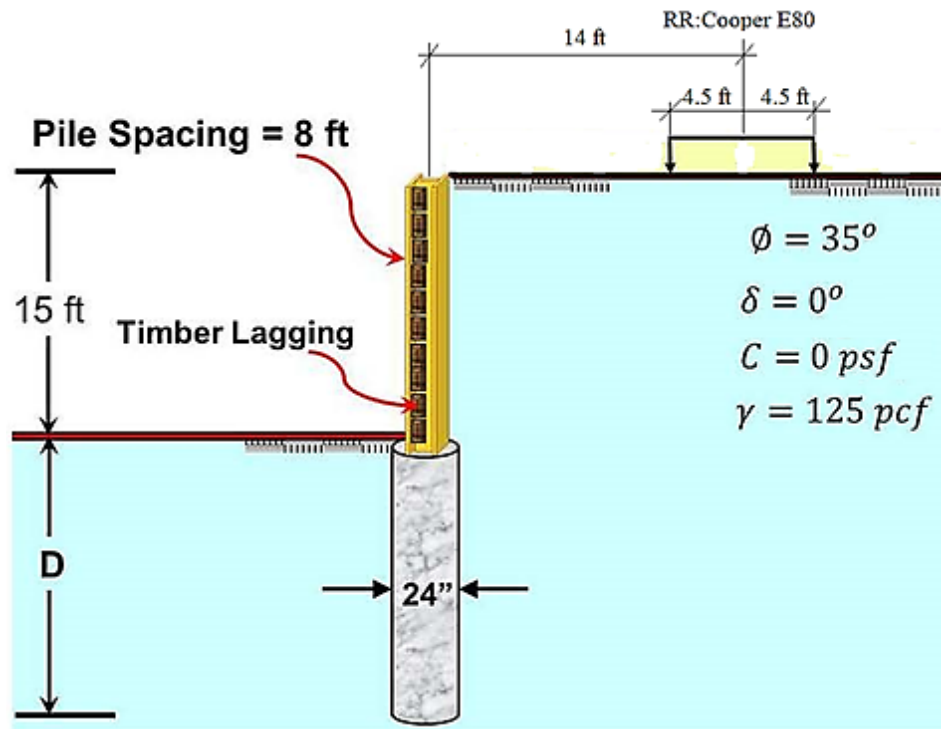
Cantilevered Soldier-Pile-Lagging Wall Example Properties
